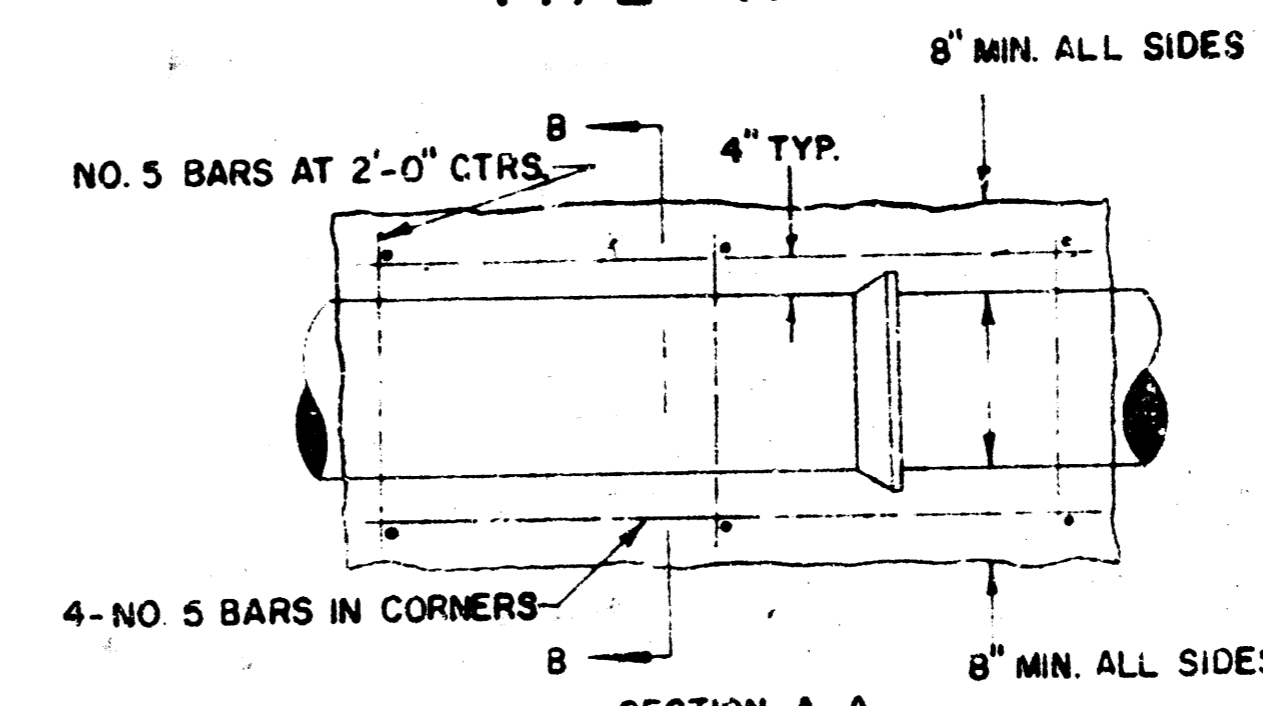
DETAIL OF DROP STACK FOR EXISTING MANHOLES IN GROUND WATER
